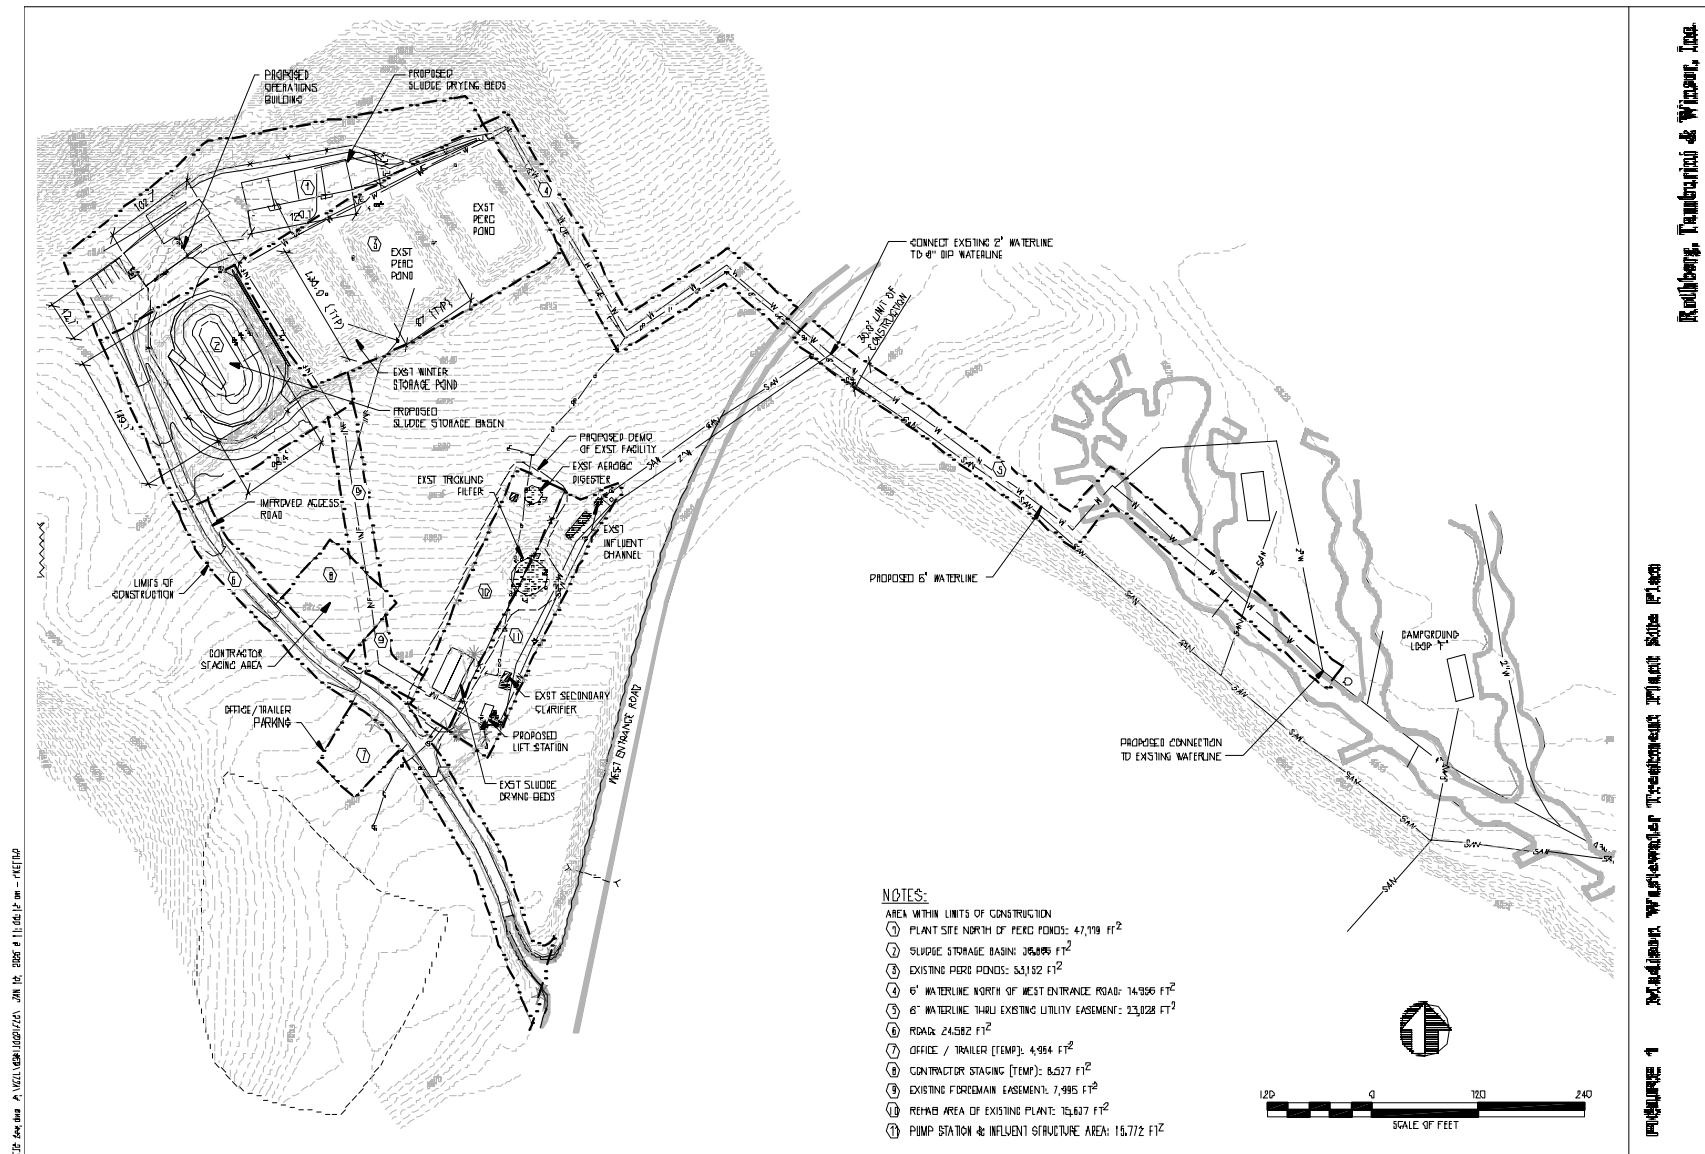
Proposed Madison Wastewater Plant Site Layout, detail.
